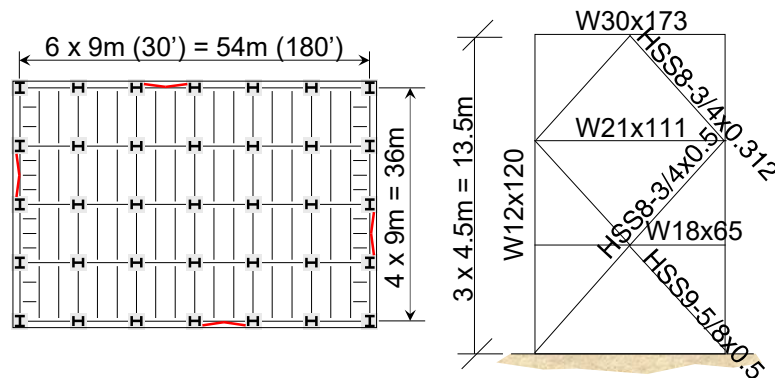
Plan and elevation of 3-story braced frame archetypes.
